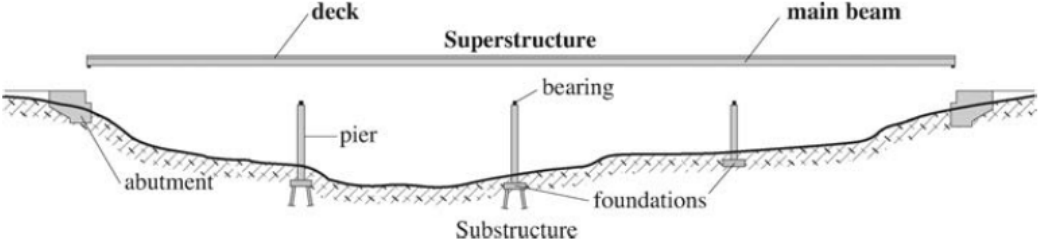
Structural elements (Lebet & Hirt, 2013)
